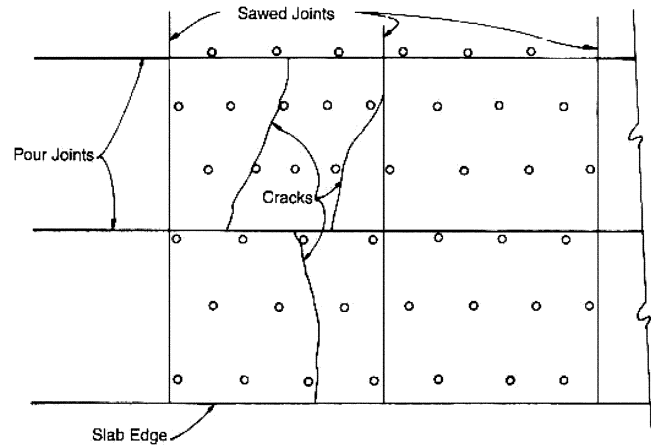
Typical layout for slabjacking holes (Warner 2004).
